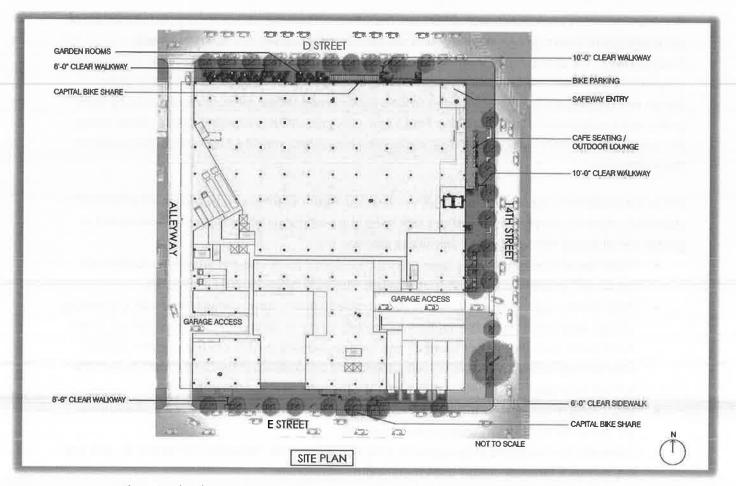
Site Plan and Public Space Design (Source: Applicant Plan Submission, Page 20, 4/13/17)
